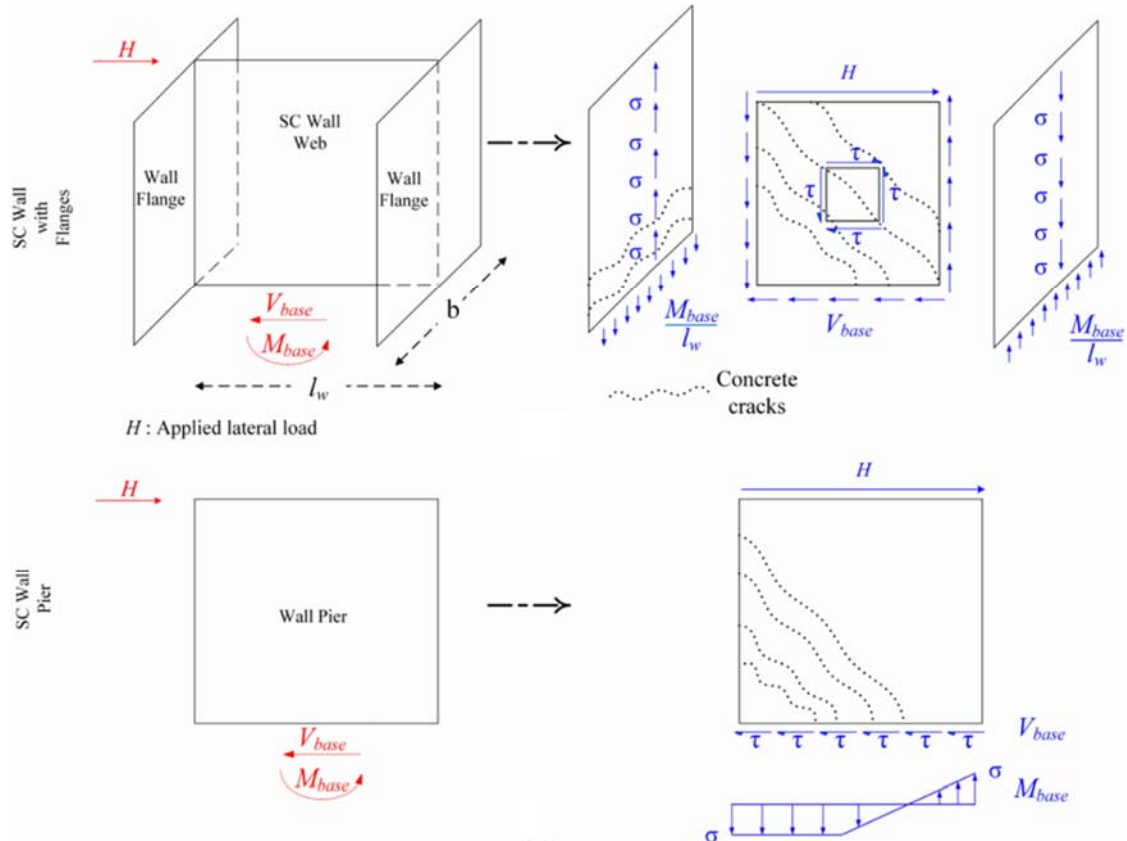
Difference in SC wall and wall pier lateral force transfer mechanisms (from [33])
